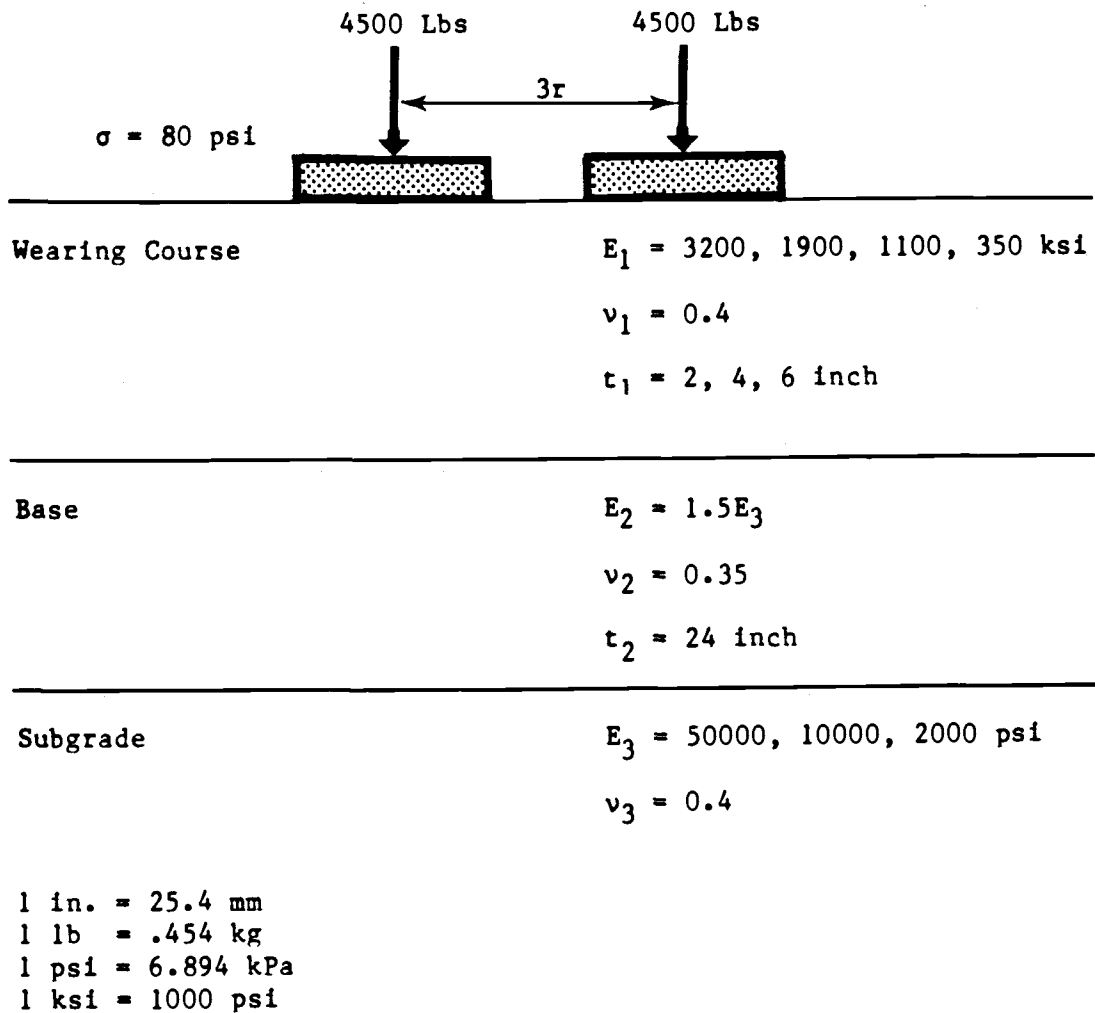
Pavement Structures Used for ELSYM5 Analysis (63).
